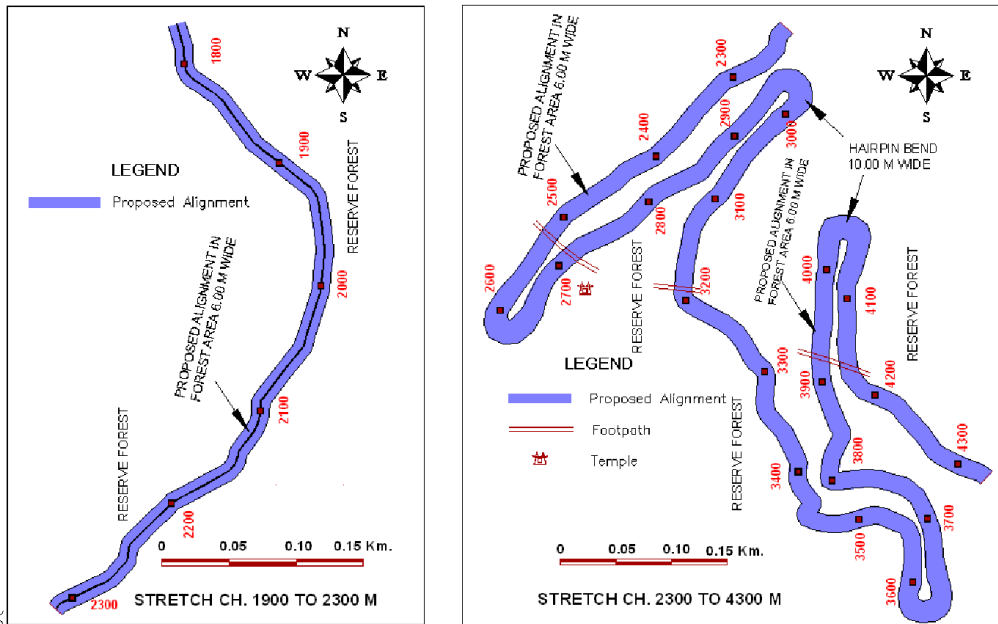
(c) - Alignment plan from 1900 m to 4300 m
